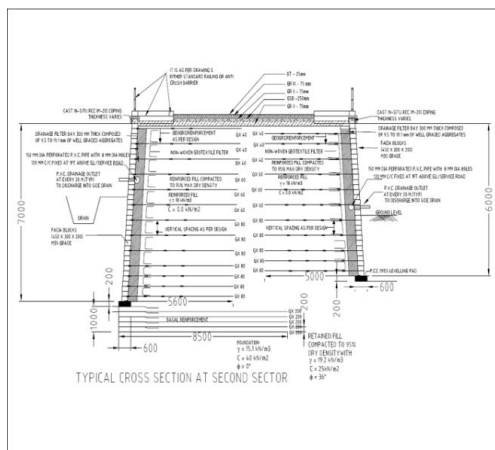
Typical geosynthetic layout for Eluru Geosynthetic Reinforced soil Wall
